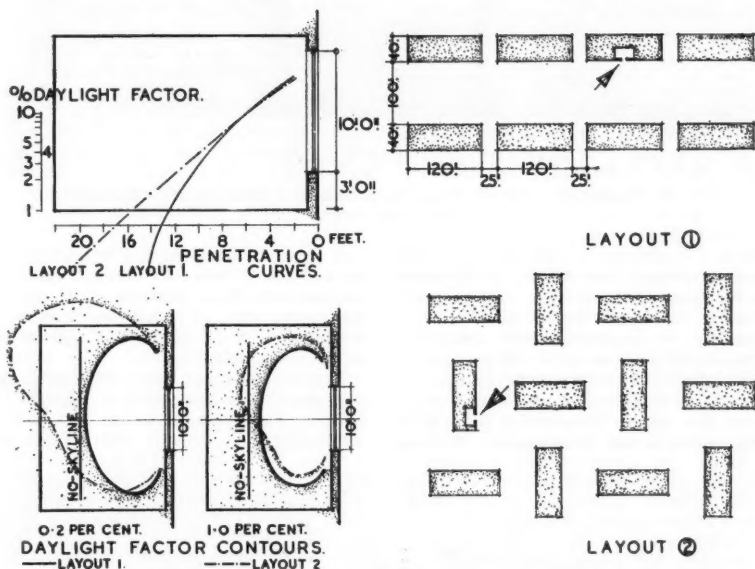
Daylight penetration can be improved by change of layout from conventional line-development (layout 1) to layout 2.
